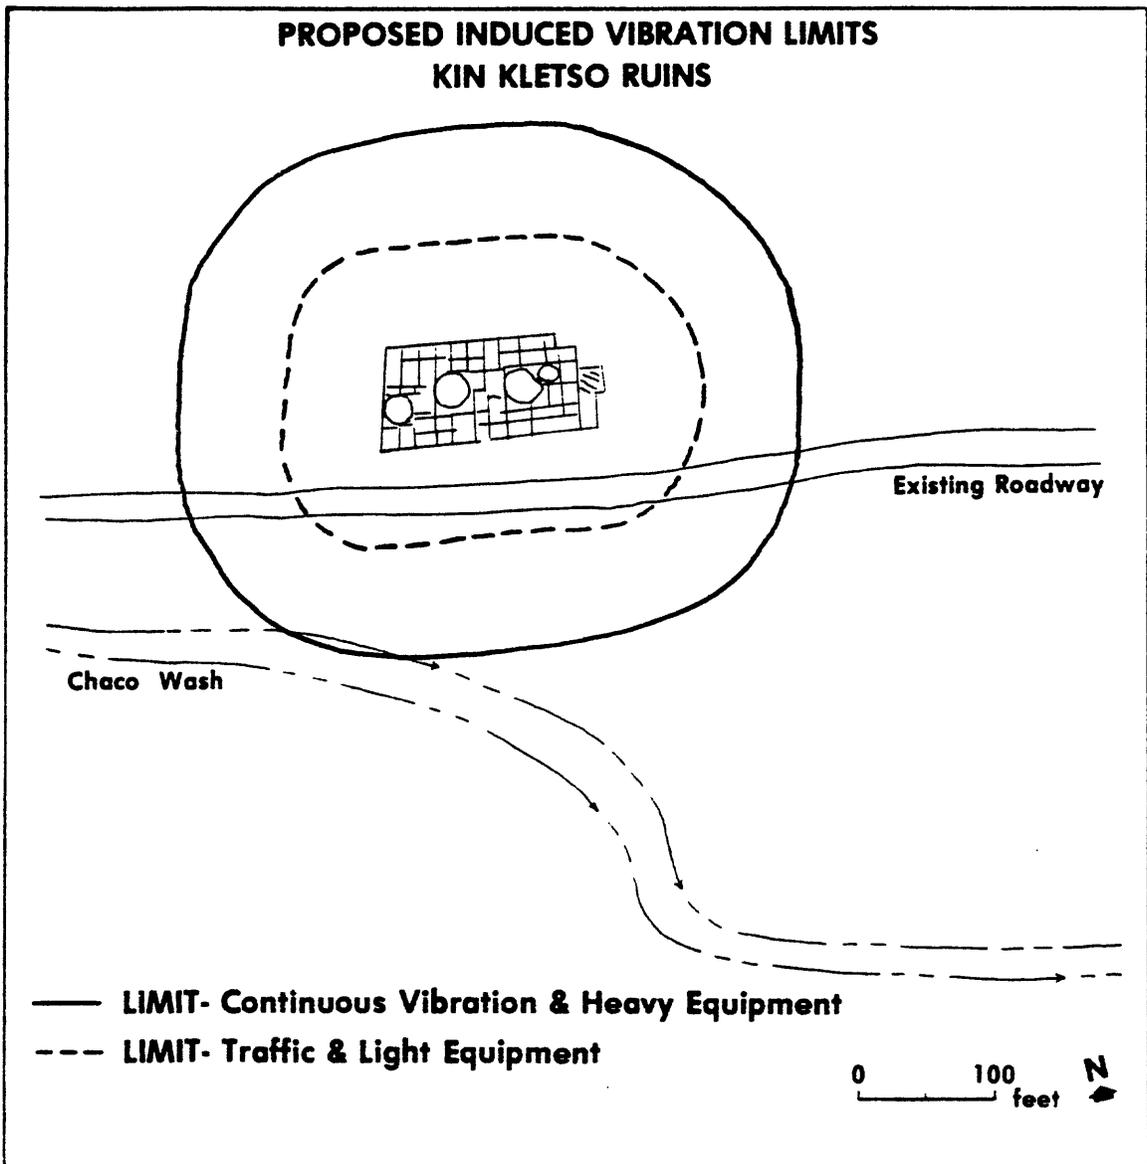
Recommended minimum distances for road building equipment and traffic.
